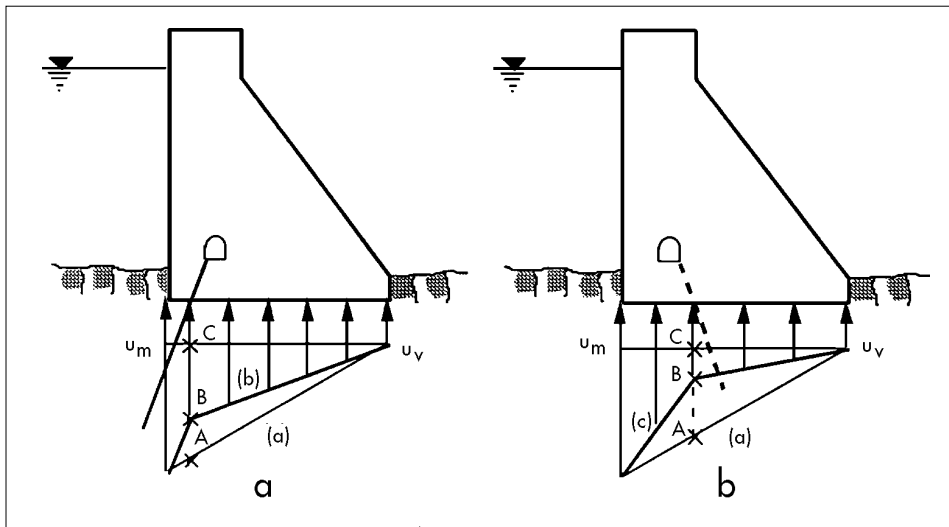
Indicative diagram of uplift: (a) - with no grouting or drainage (b) - with a grout curtain (c) - with drainage
